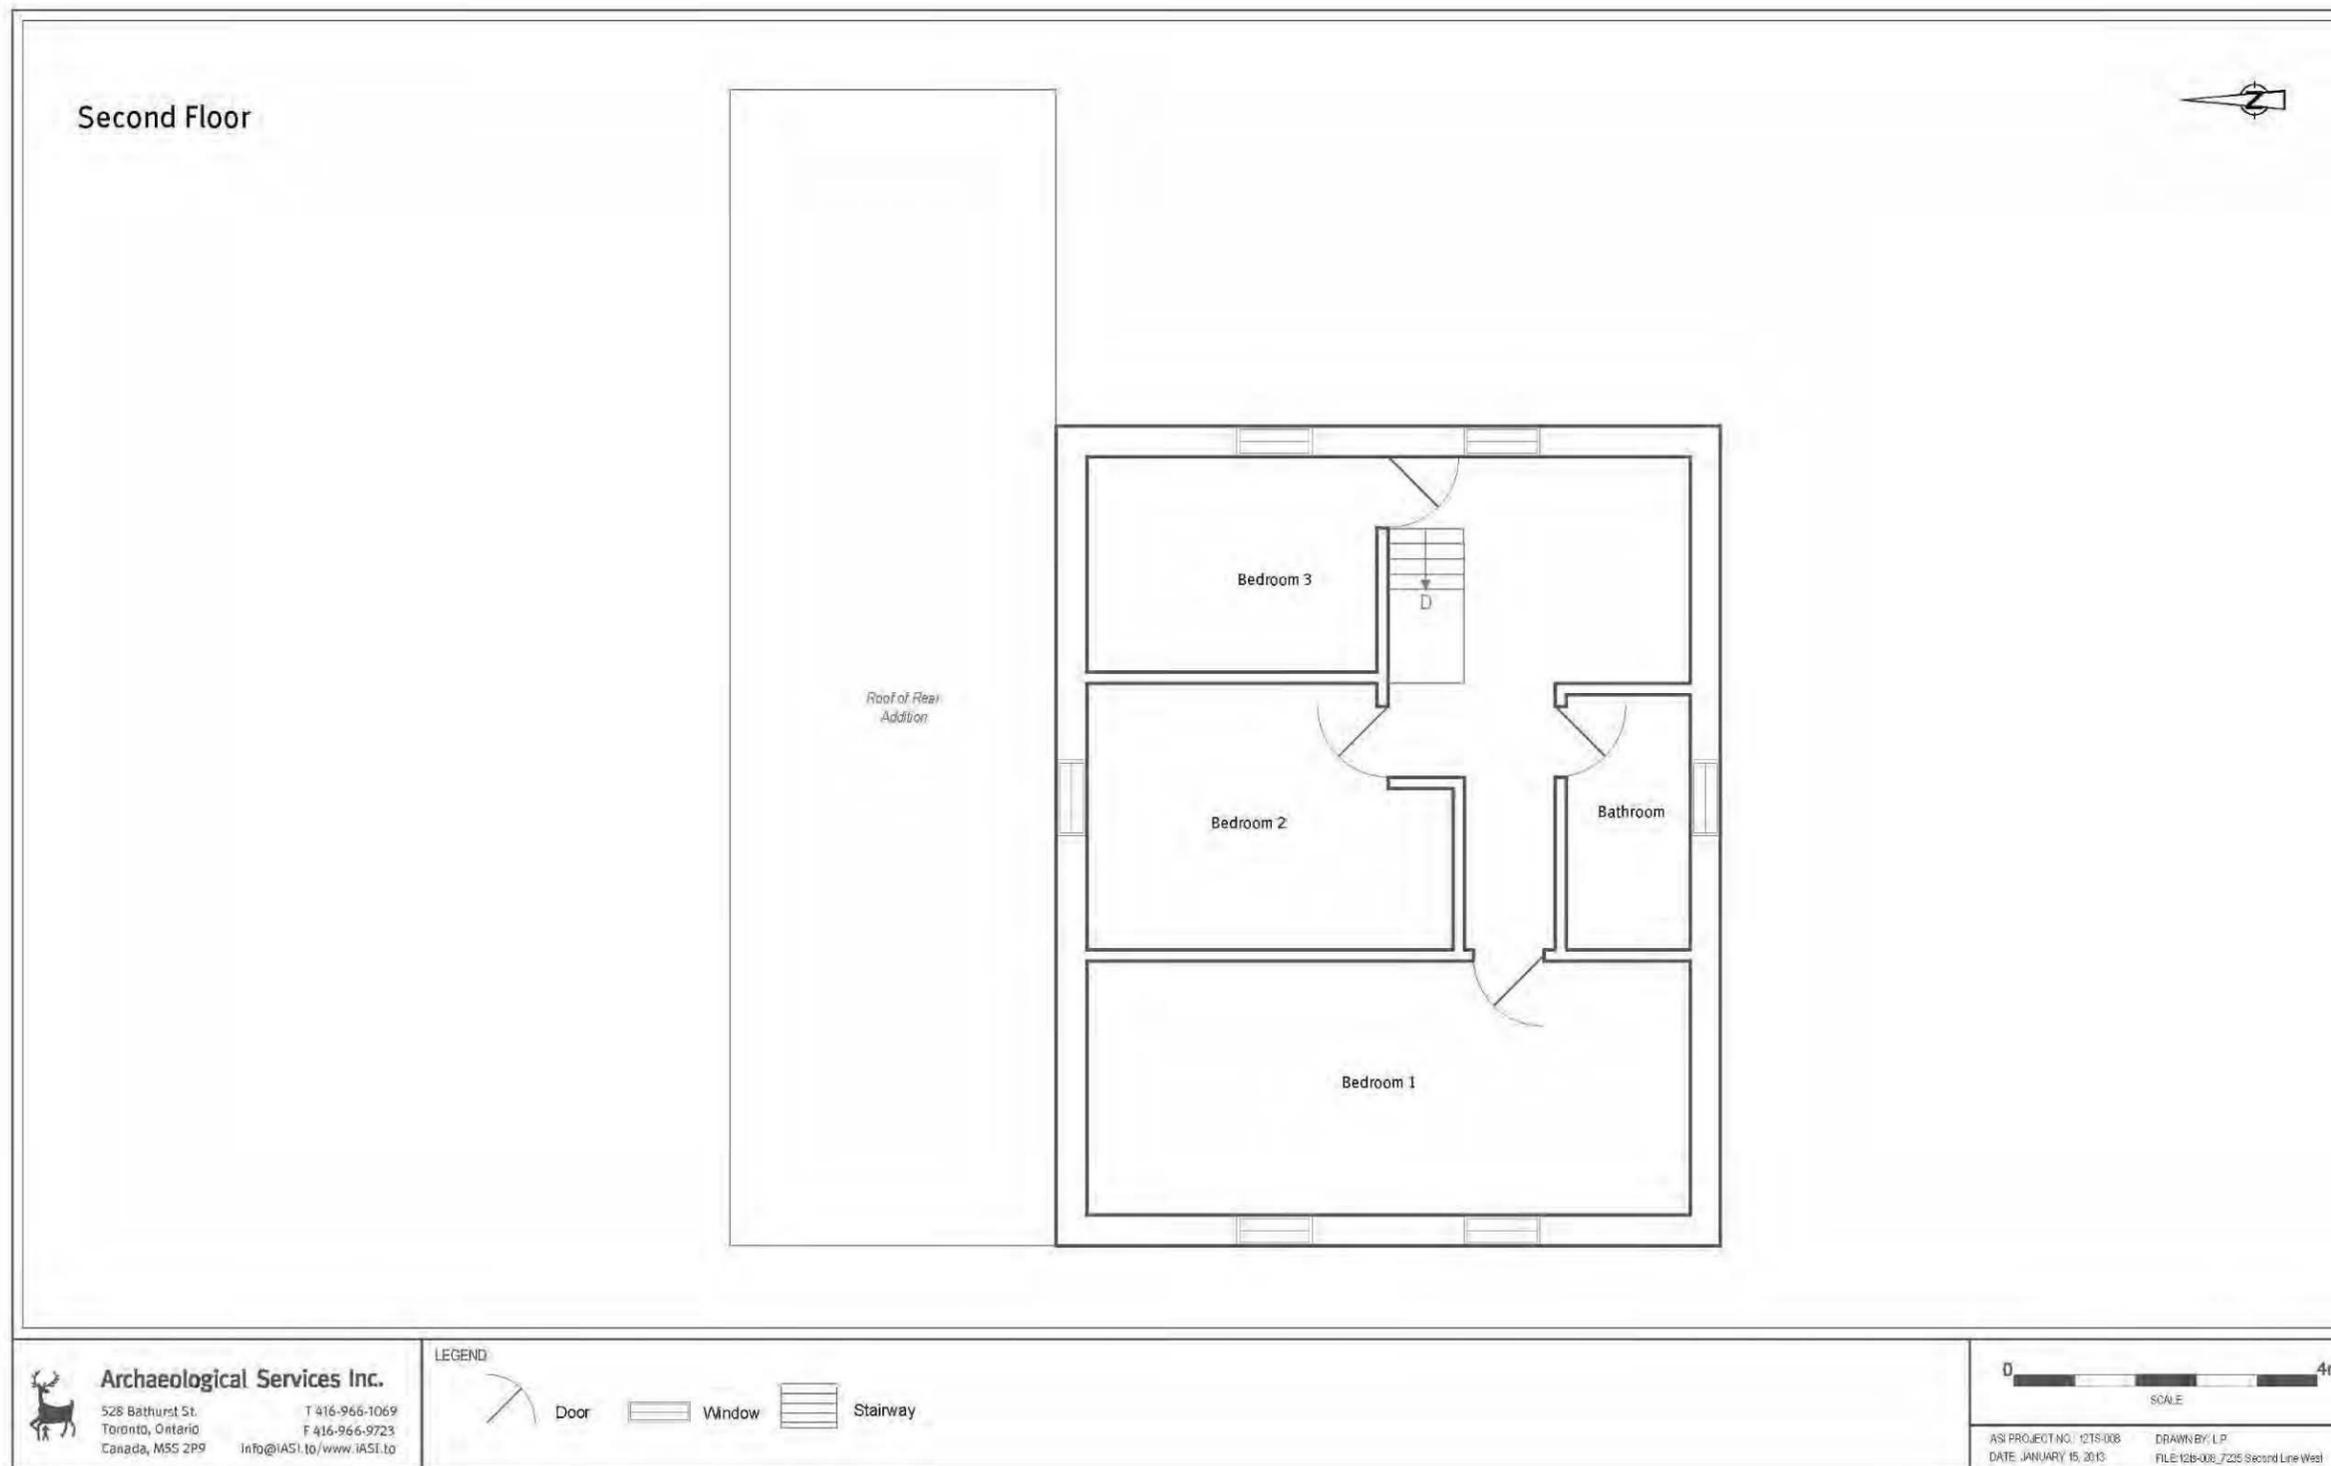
Schematic floor plan of the second floor at 7235 Second Line West.
